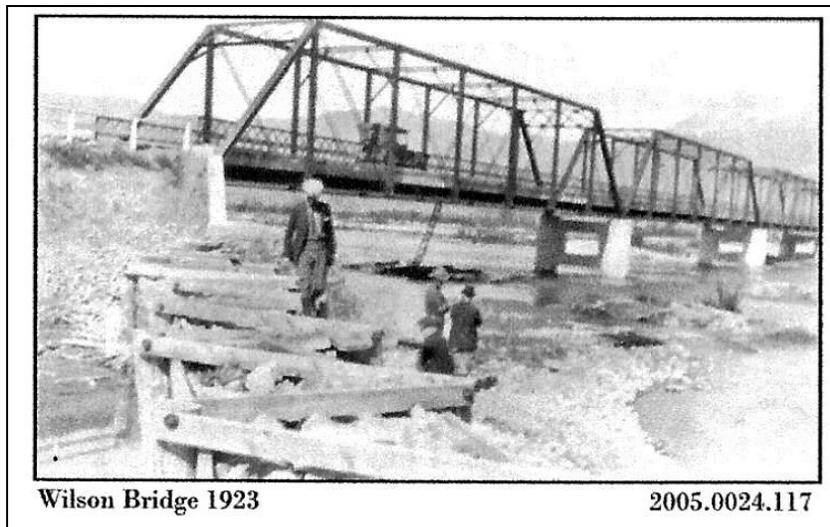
“The First Wilson Bridge” was built in 1915 and spanned the Snake River on the Jackson-Wilson Road. It was replaced in 1959, and parts of the bridge were used in the construction of Structure DEY in 1960. (courtesy “Bridges through Time,” Jackson Hole Historical Society & Museum Chronicle, Vol. XXVIII, No. 1, Spring 2008)
